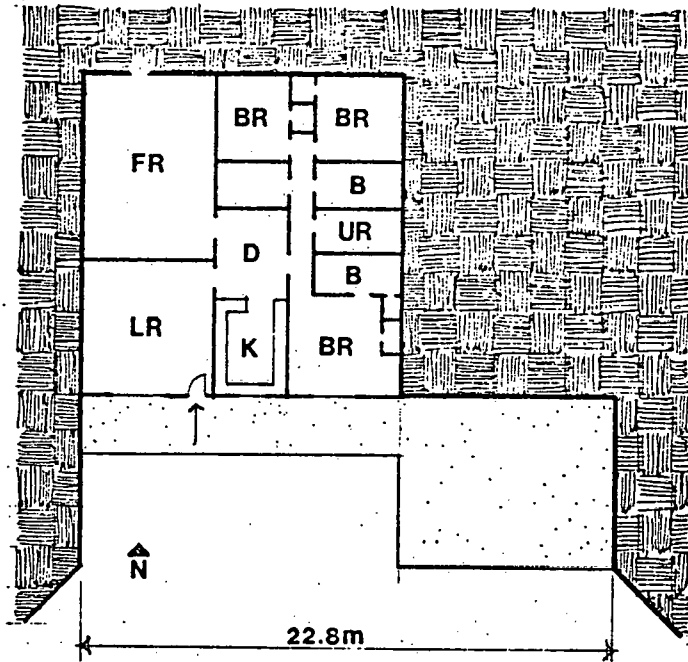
Site E is a concrete structure with an insulated roof, and an insulated facade facing south.
